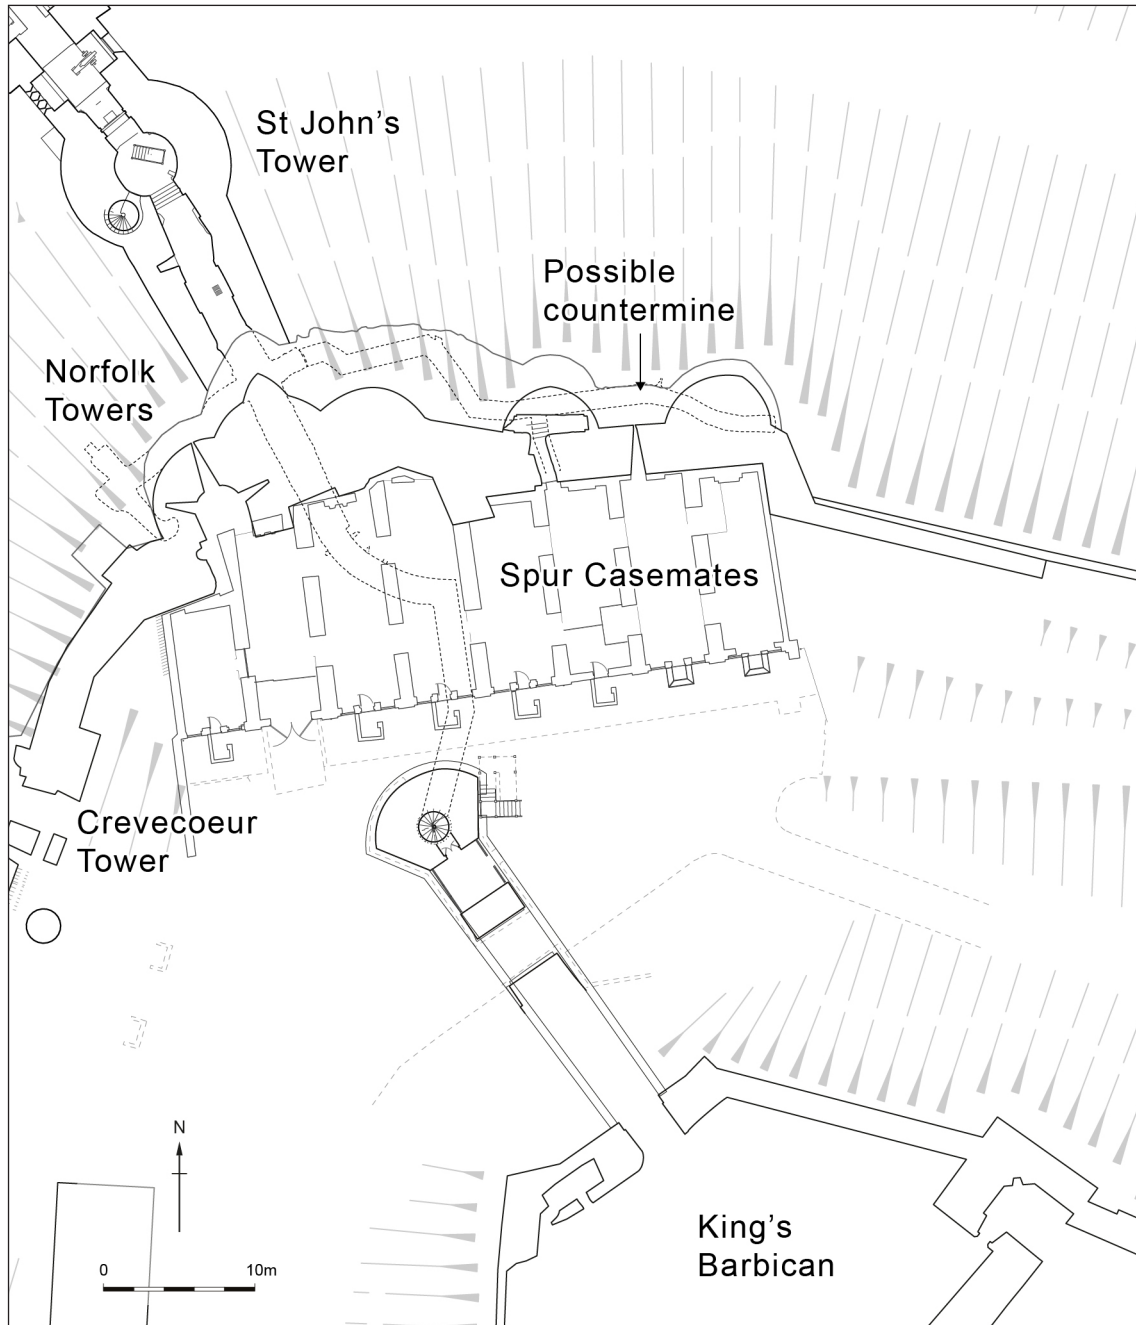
Plan of St John's Tower, Norfolk Towers, Spur Casemates and the tunnel leading from St John's Tower to the Outer Bailey
